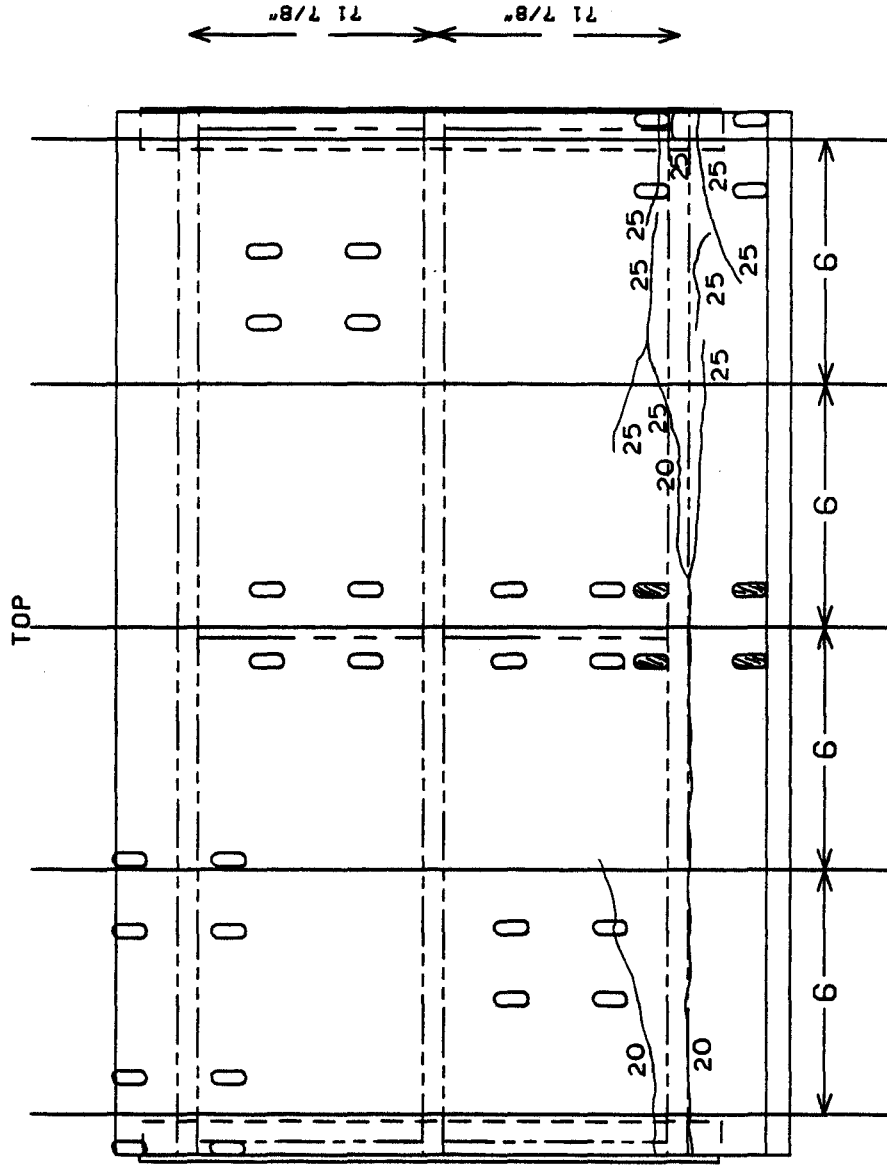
Top Cracking Pattern (Third Bridge - Test No. 2)
